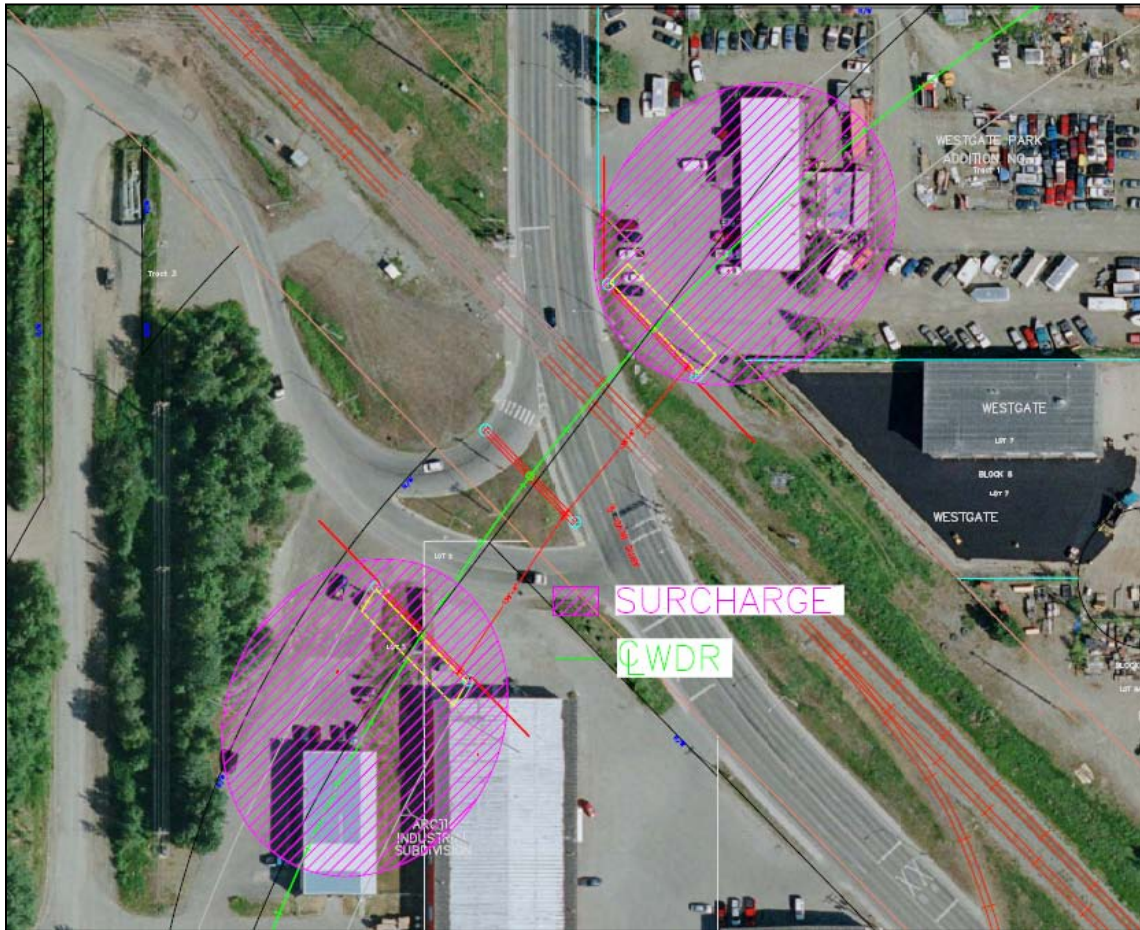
Limits of Excavation and Surcharge at Bridge Embankments
